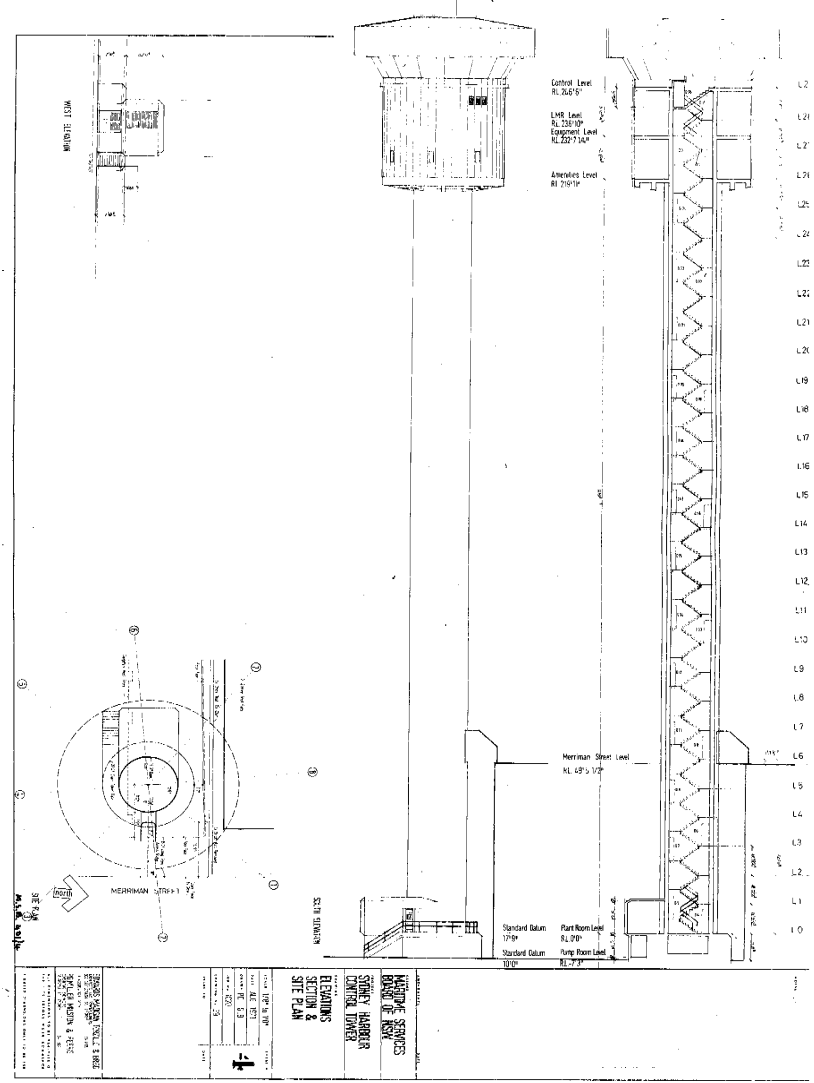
Original elevation and section through the HCT :- Sheet 4; August 1971
